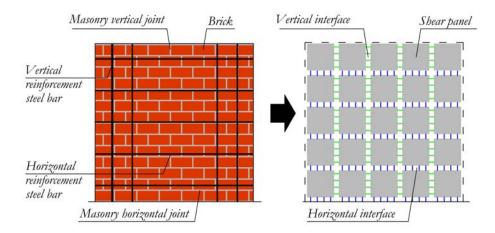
Real masonry reinforced wall (left); numerical representation of a panel with discrete elements (right)
